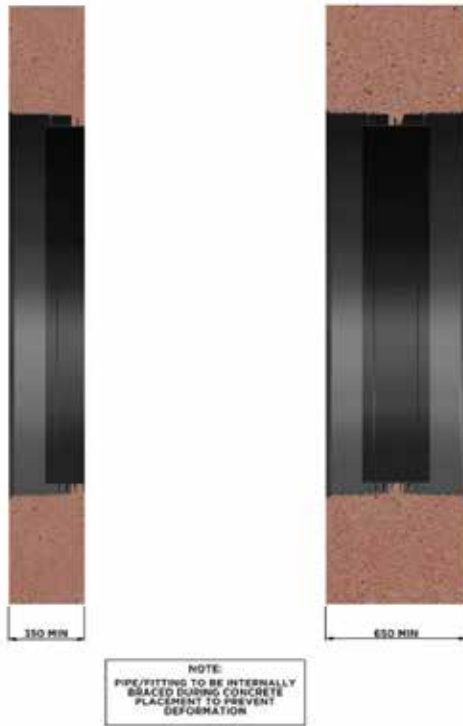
Single socket wall fitting (left), double socket wall fitting (right).
